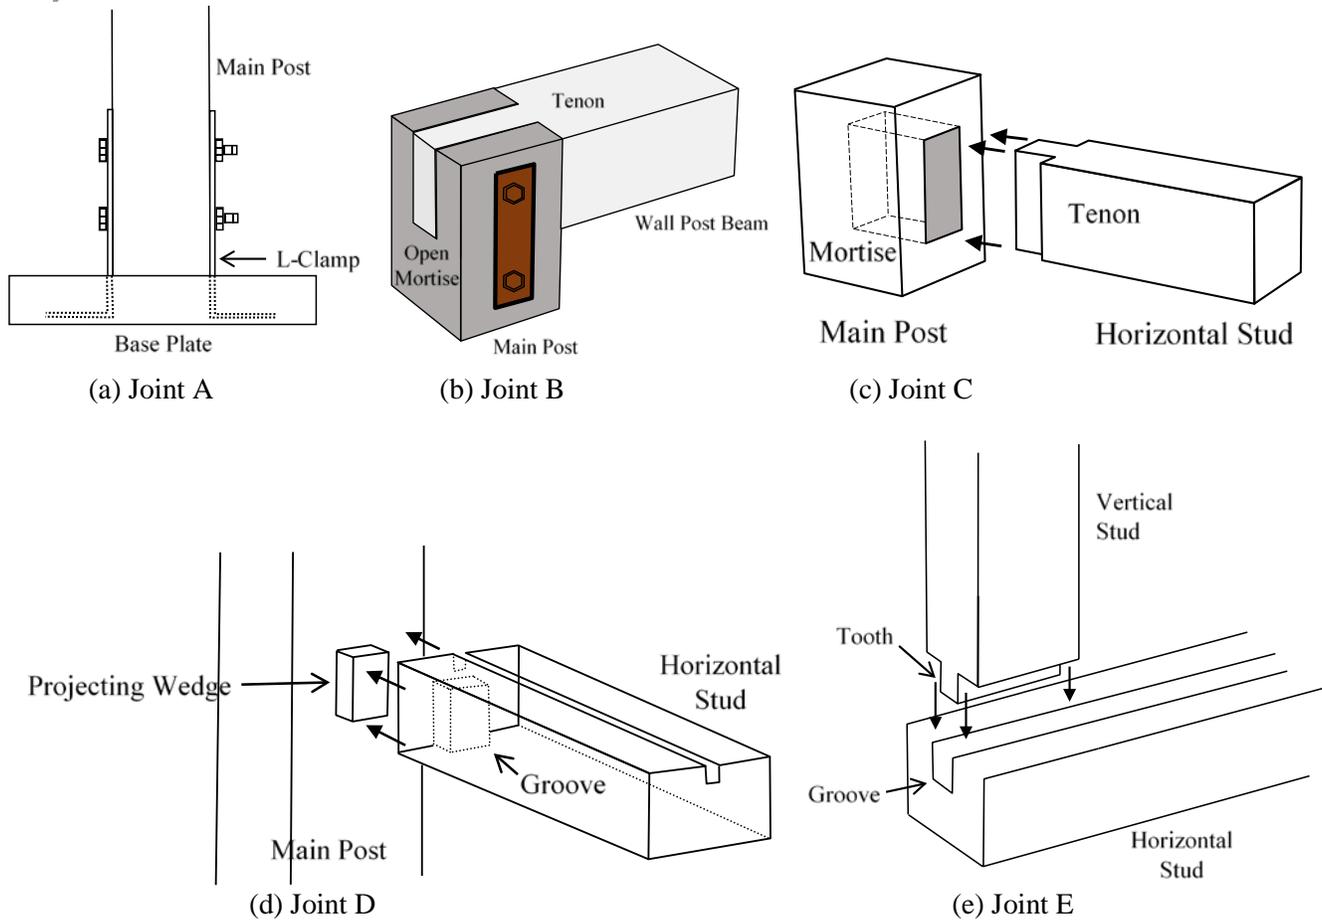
Details of various connections between different members of the frame (location shown in Fig. 2)
